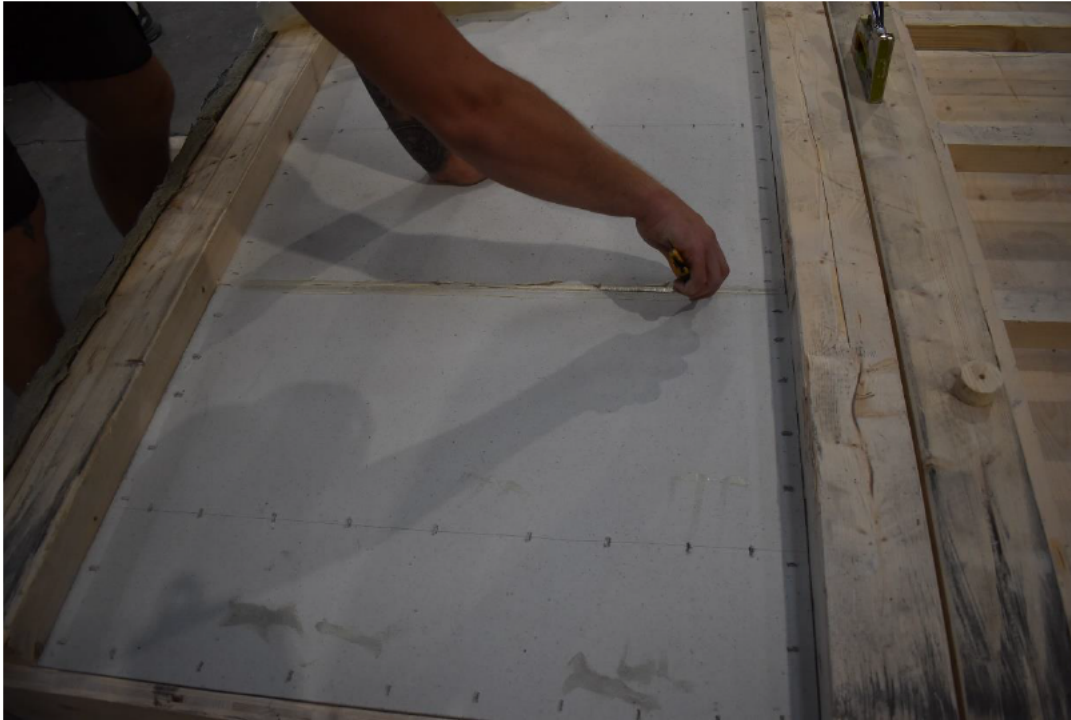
First two boards of the upper layer is being mounted. Glue residue from the accidentally glued gypsum joint is being removed.
